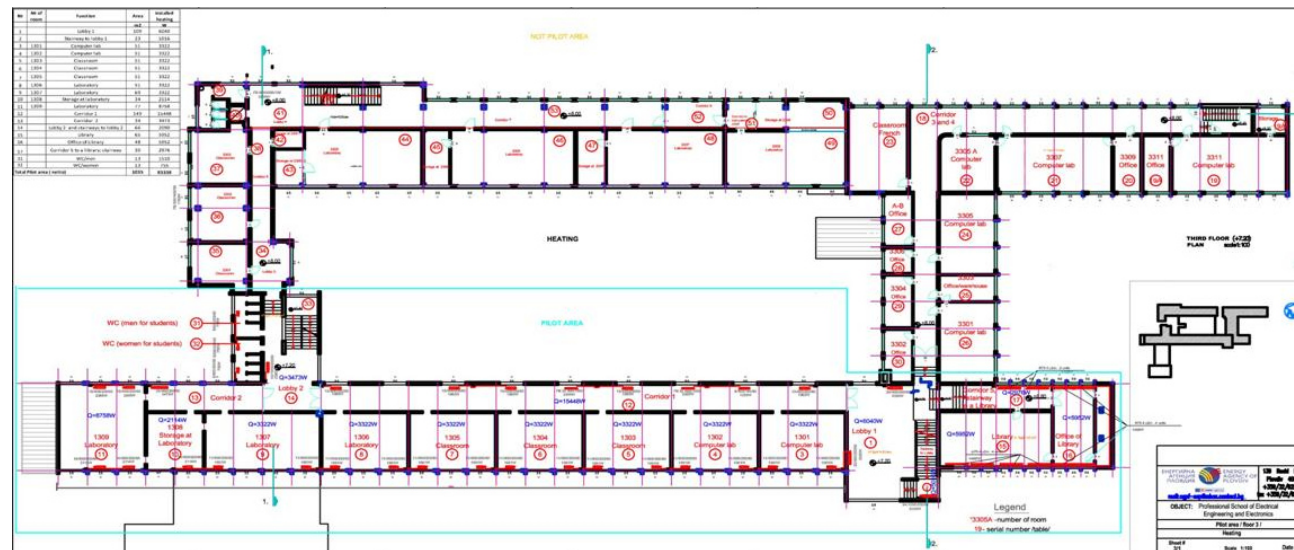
Plovdiv School: 3rd floor heating plant (Pilot in blue lines)
